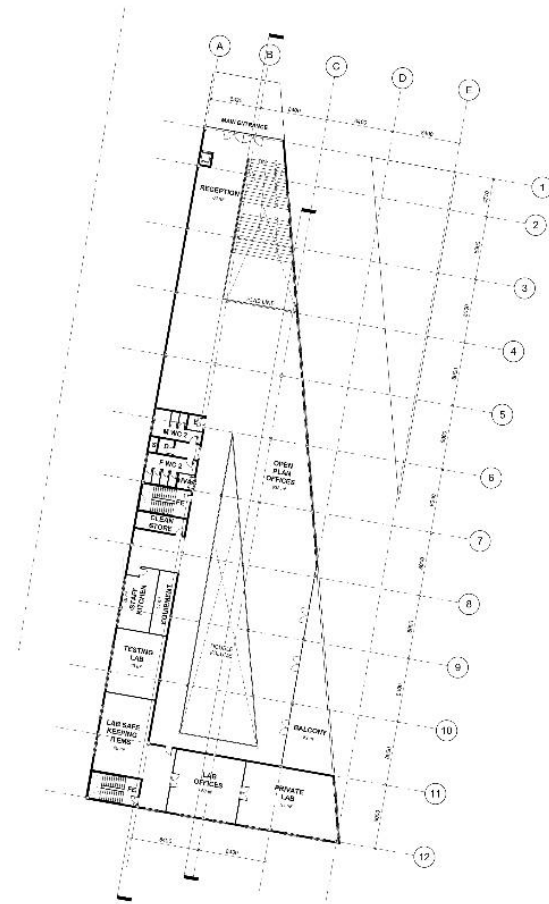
Revision 1 floor plans by Author at 1:1600.
